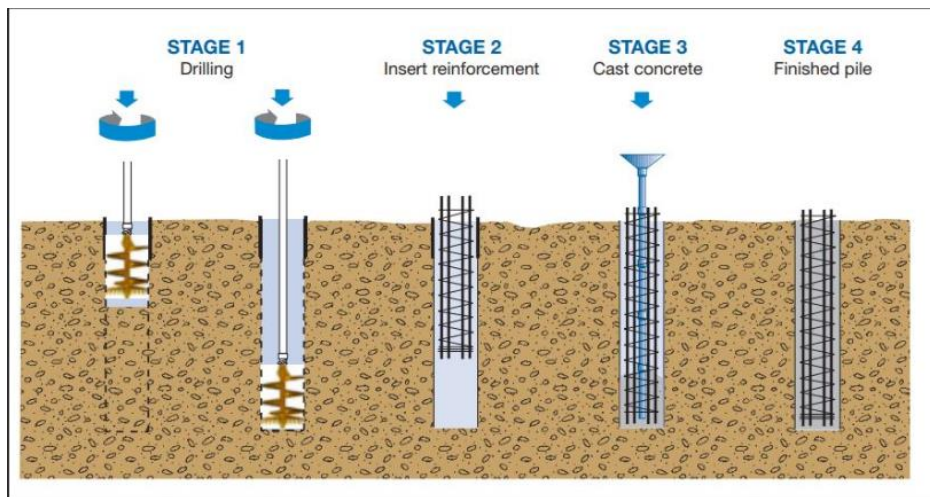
Example of bored cast in place reinforced concrete piles (note that temporary casings which may be used to prevent bore hole from collapsing is not shown)⁷.
